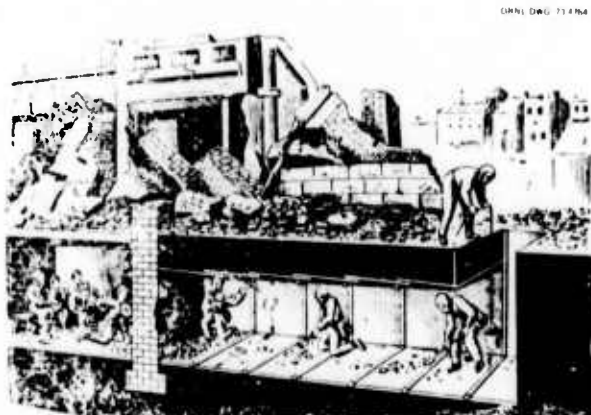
Opening a shelter through holes in the wall made from an underground tunnel.
